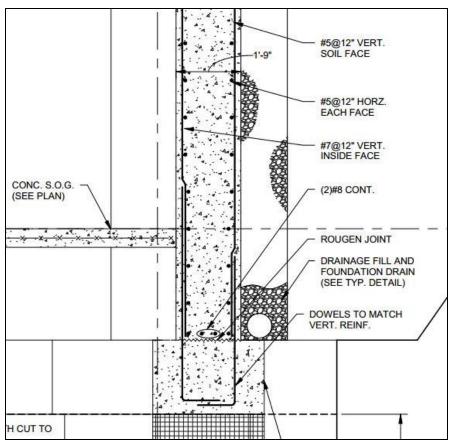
Retaining Wall Detail (Courtesy of Stantec)
